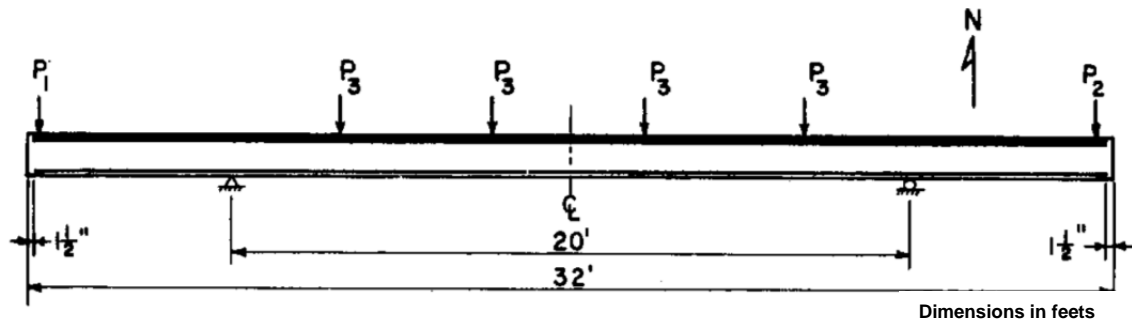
Loading arrangement on beams tested by Lin et al [15]
